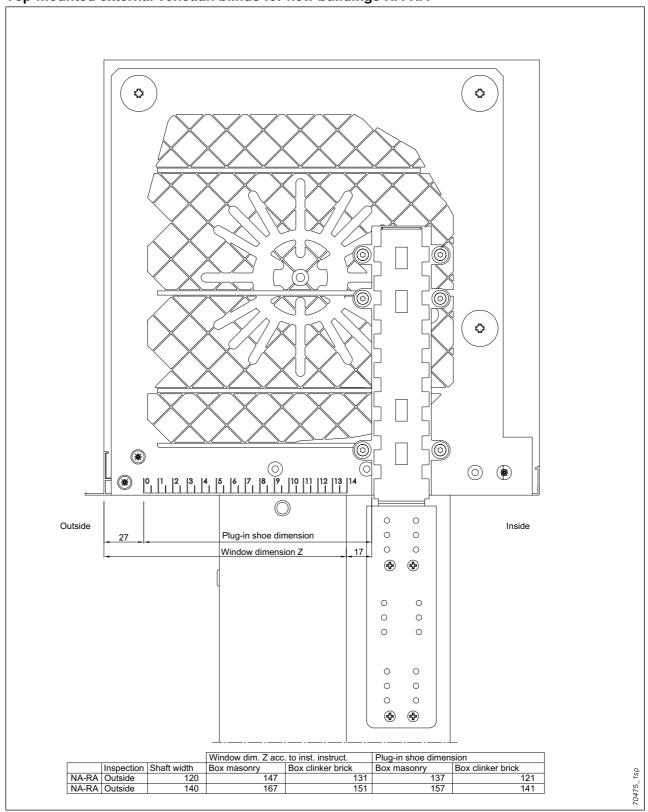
Positioning of mounting sleeve for top-mounted external venetian blinds for new buildings NA-RA
